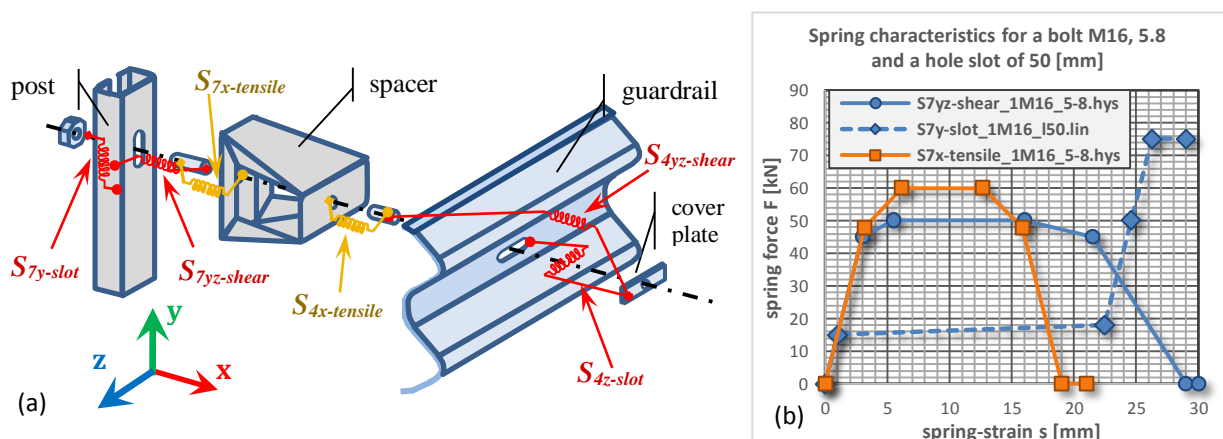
Steel guardrail system GS2 hard shoulder barrier – connection to a post.
